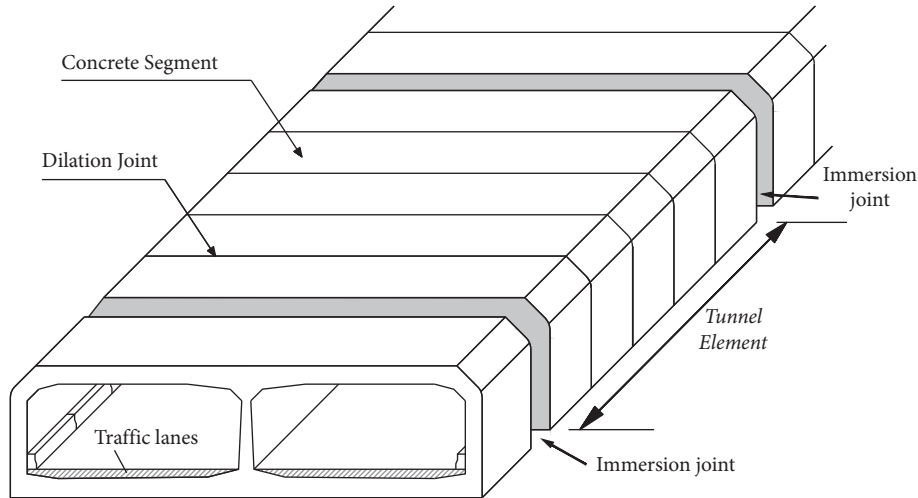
Schematic of a segmented immersed tunnel structure with joints.
